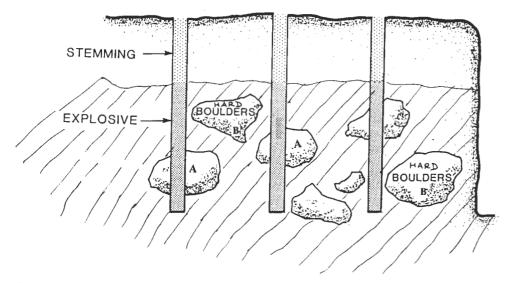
Boulders in soft material. Boulders marked A will be broken while boulders marked B will not be broken.
